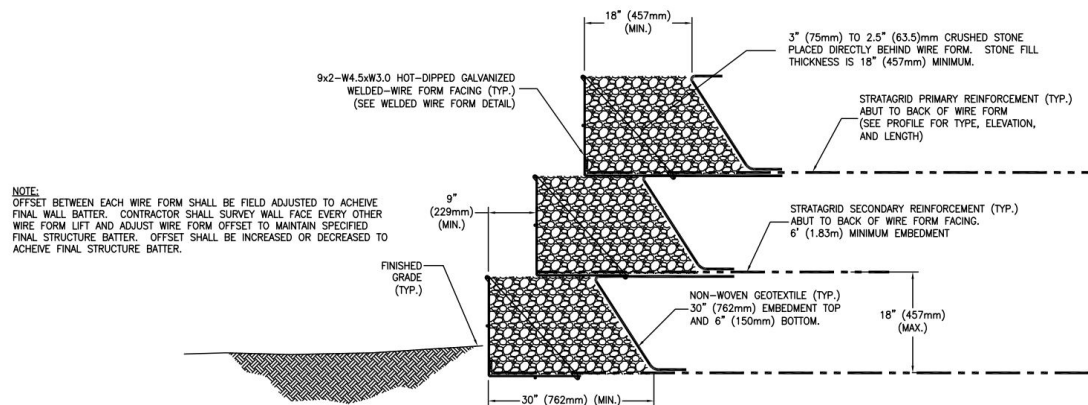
Reinforced soil slope – Rock filled facing detail – 1:1 or steeper.
